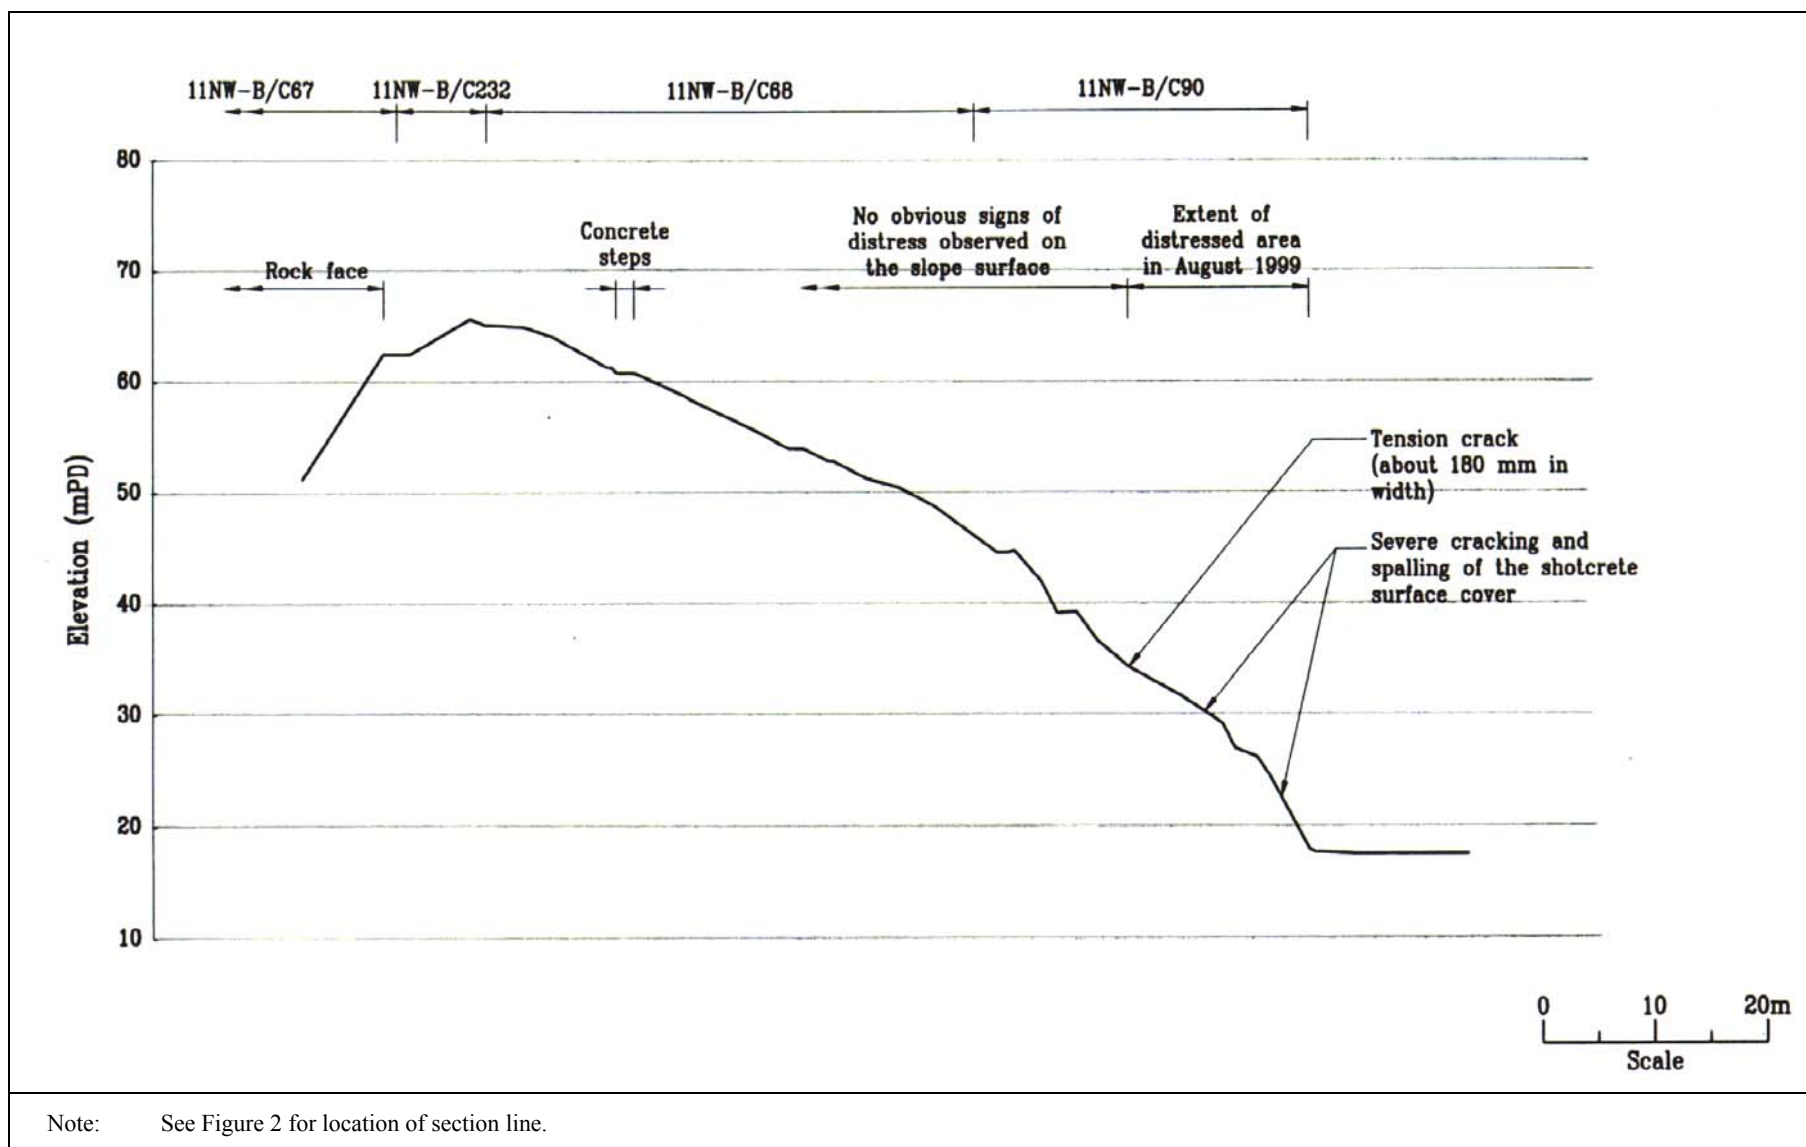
Topographic Section 3-3 through the Southern Distressed Zone
